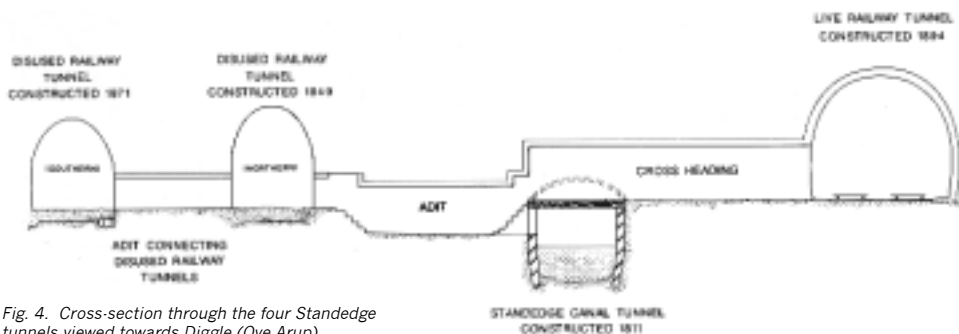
Cross-section through the four Standedge tunnels viewed towards Diggle (Ove Arup)
